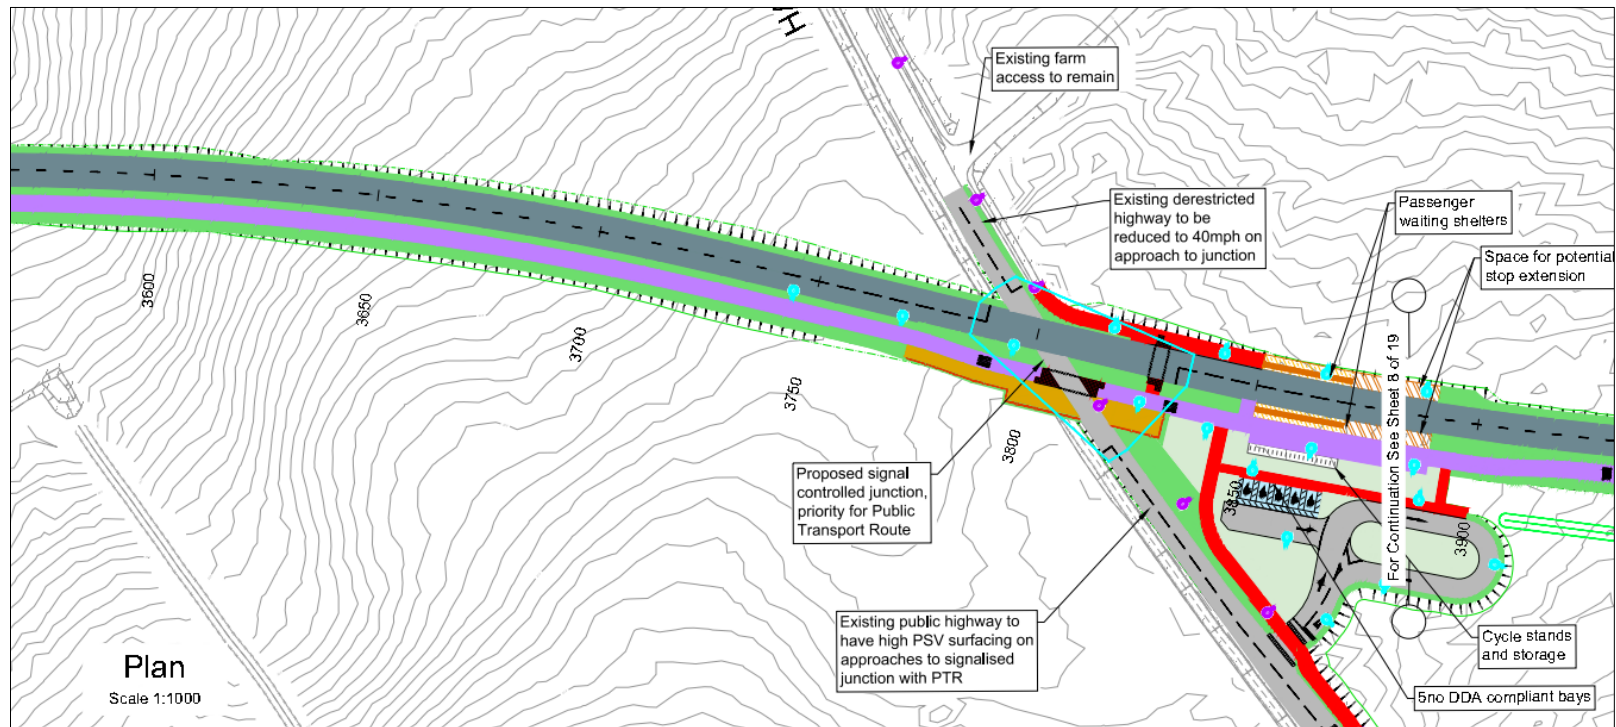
Plan of the Amended Layout at Hobson's Brook (2025 Version Layout) [CD1-12.05, page 3]
